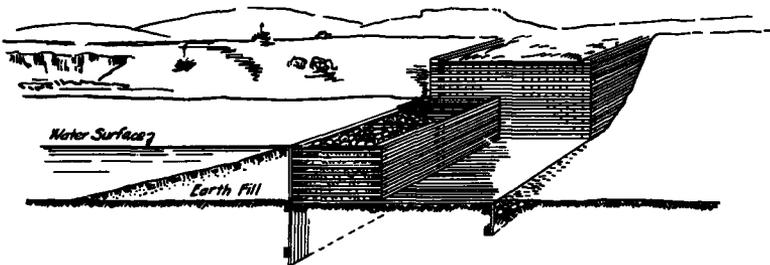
CROSS SECTION OF ROCK FILLED TIMBER CRIB DAM.
